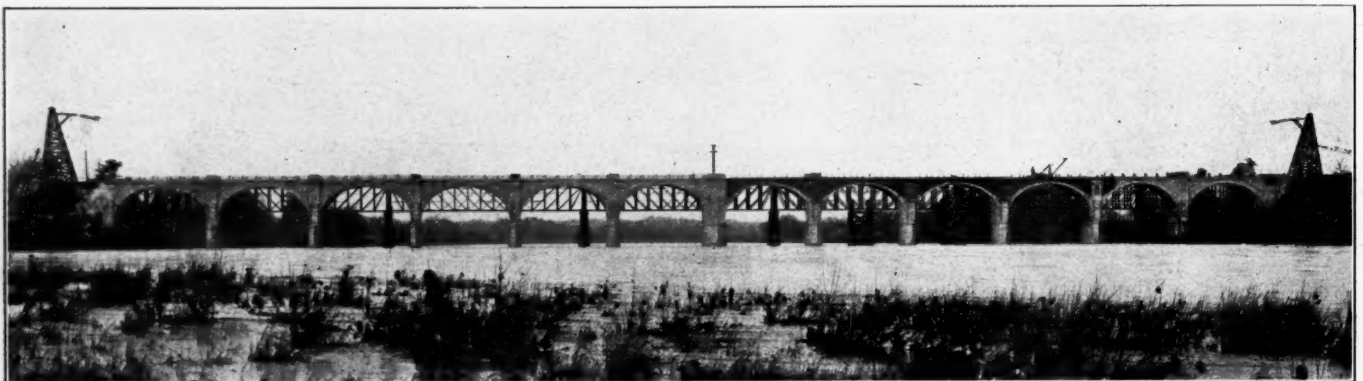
Yardley Bridge Looking from the Downstream Side.
